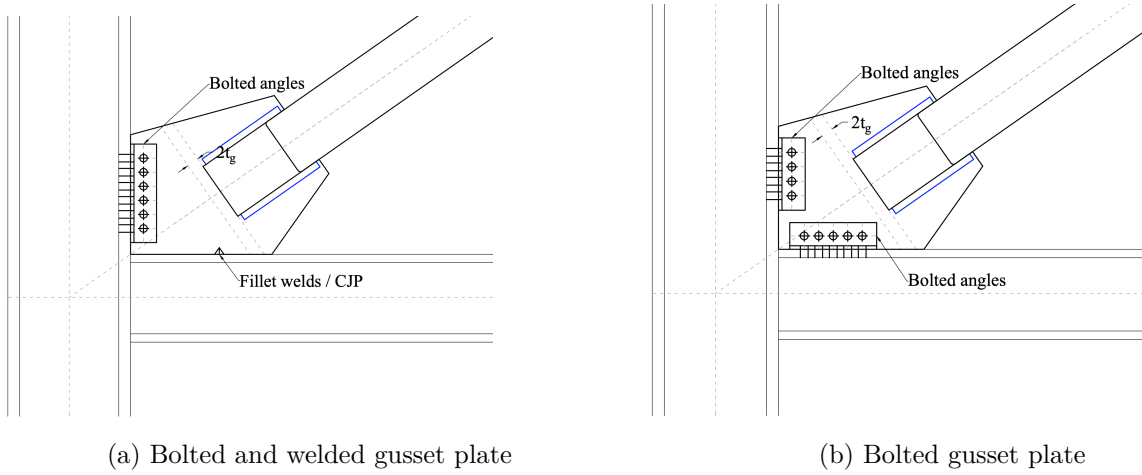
Bolted/welded gusset plate associated to the SHG connection
